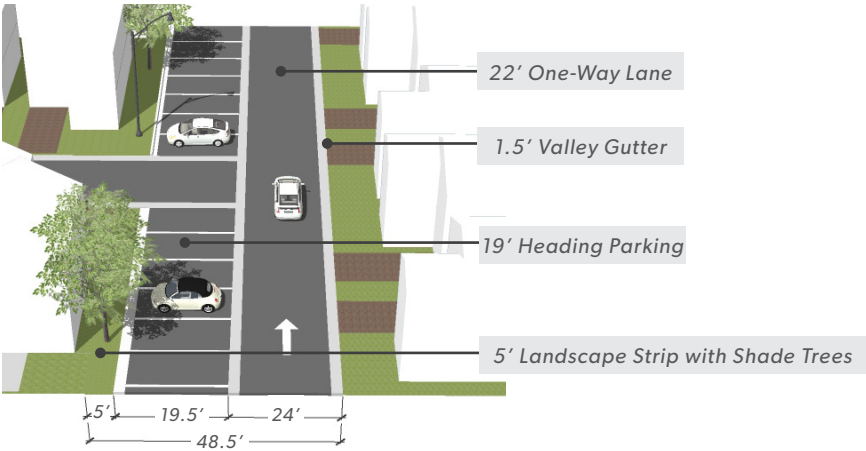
ALLEY TYPE "A" TYPICAL SECTION
